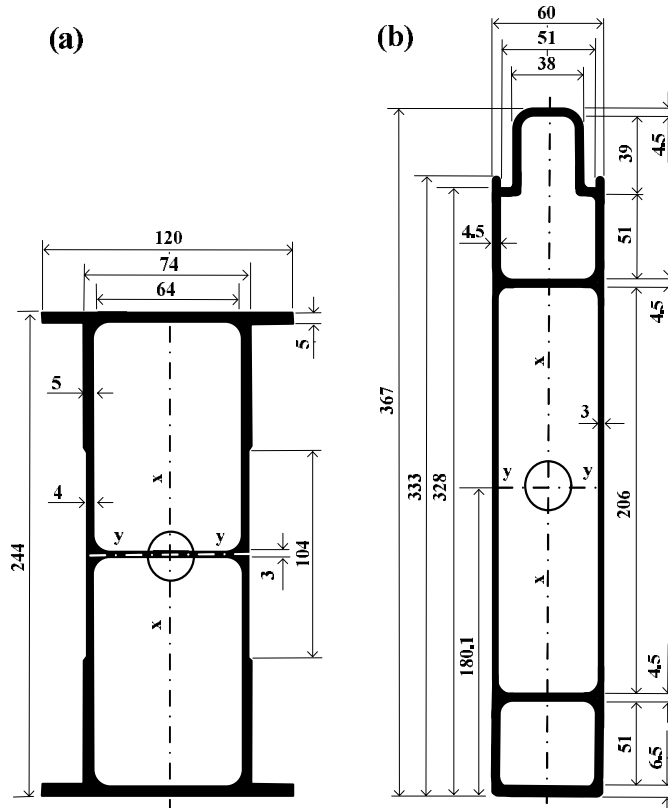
Startlink shapes: a) floor beam; b) stud-column .
